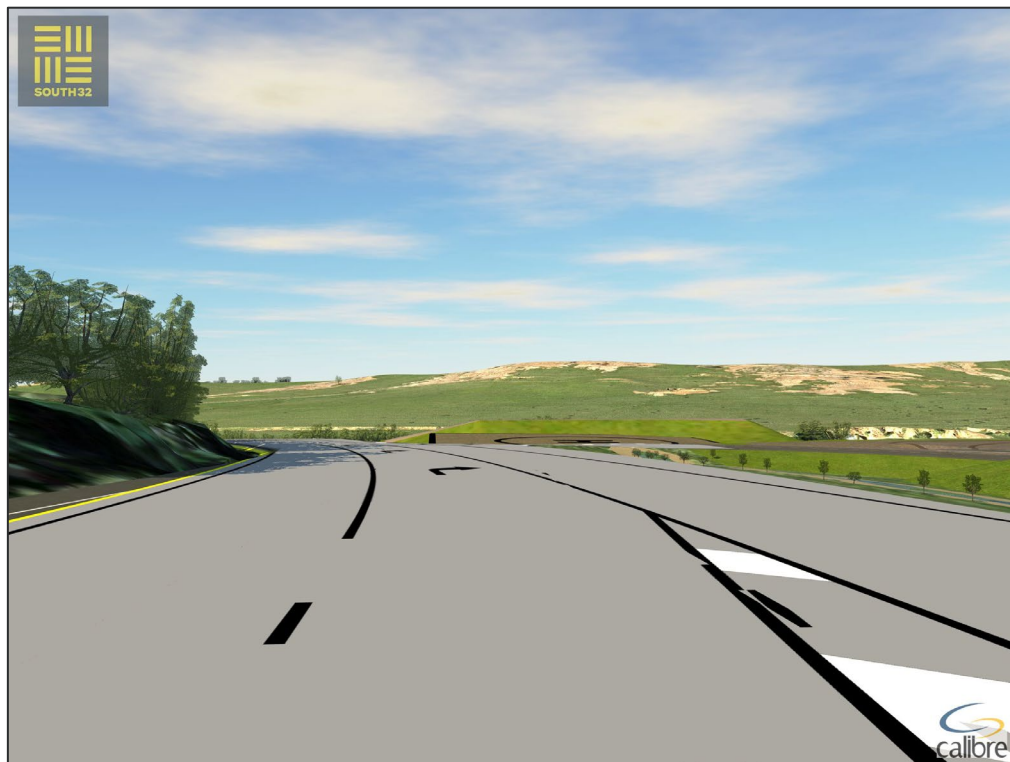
View towards the Site from Menangle Road, heading north toward Site entrance (Site screen plantings three years old)
